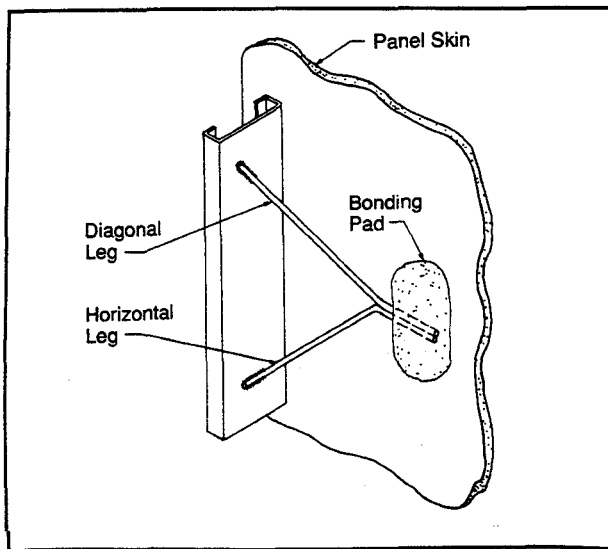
Trussed rod gravity anchor (from PCI [1993]).
